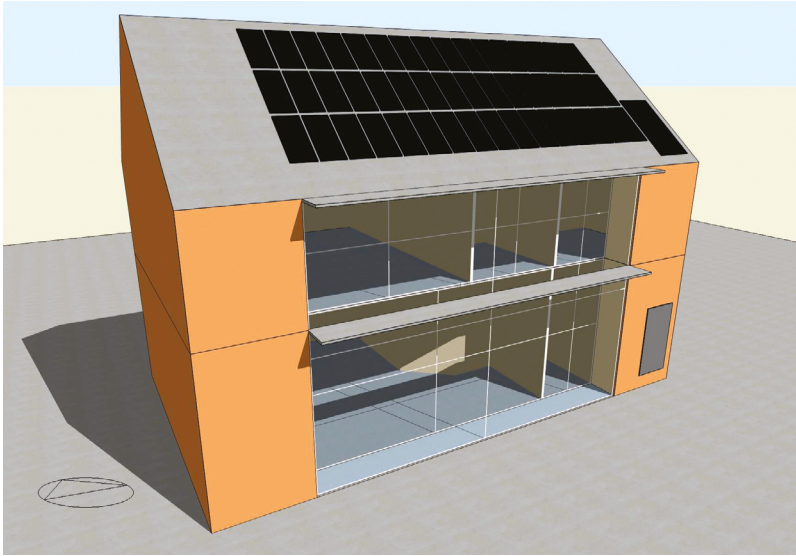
View of the laboratory building with solar collectors on the roof and one on the facade (Source: own elaboration)
